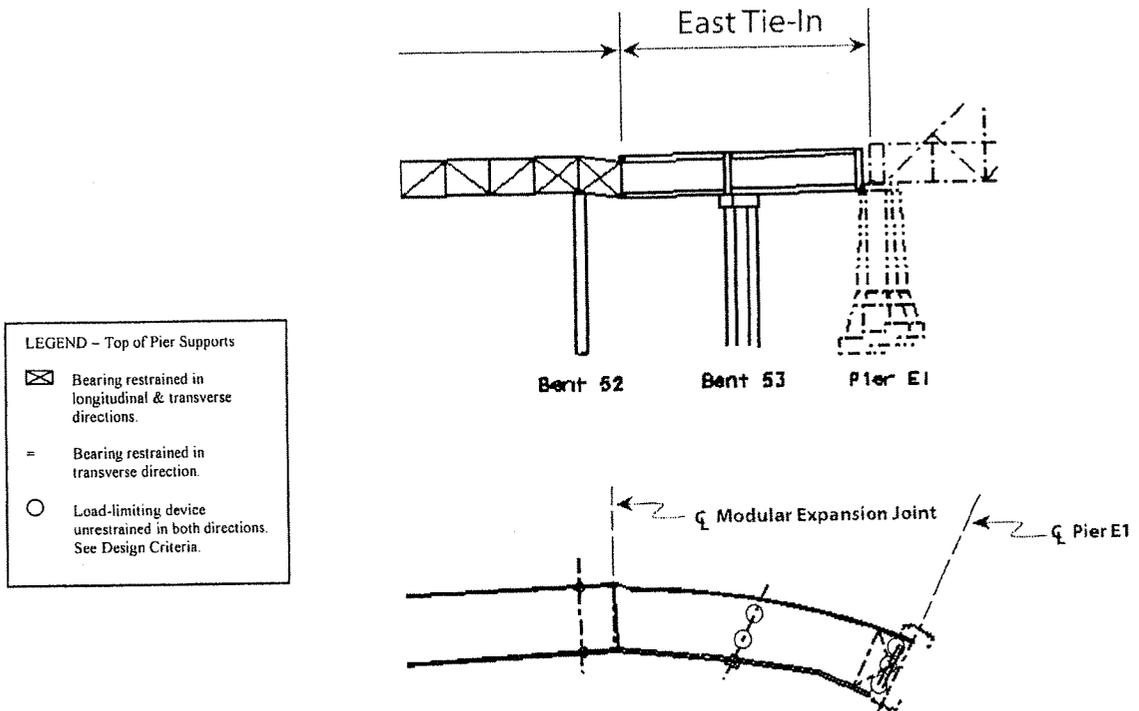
Schematics Elevation and plan-Articulation of Temporary Bypass Structure
